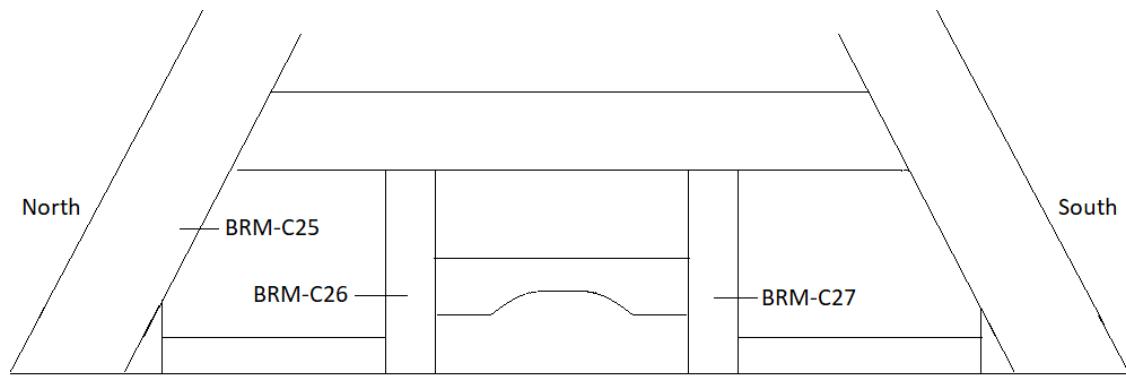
Schematic drawing of truss 2, showing the location of samples BRM-C25–27
